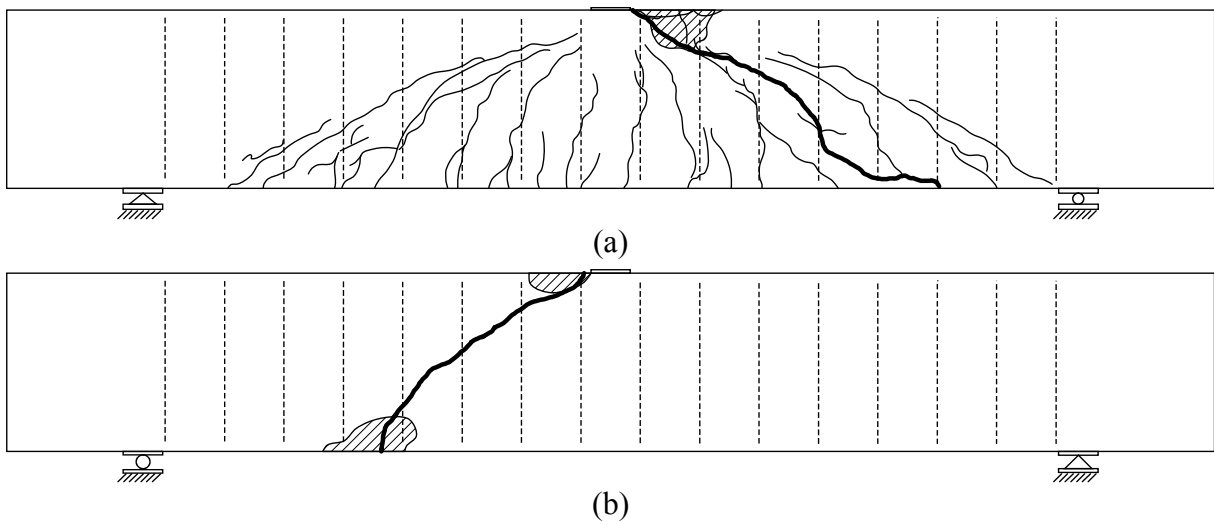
Observed damage in specimen P1S11, (a) front side, (b) back side
